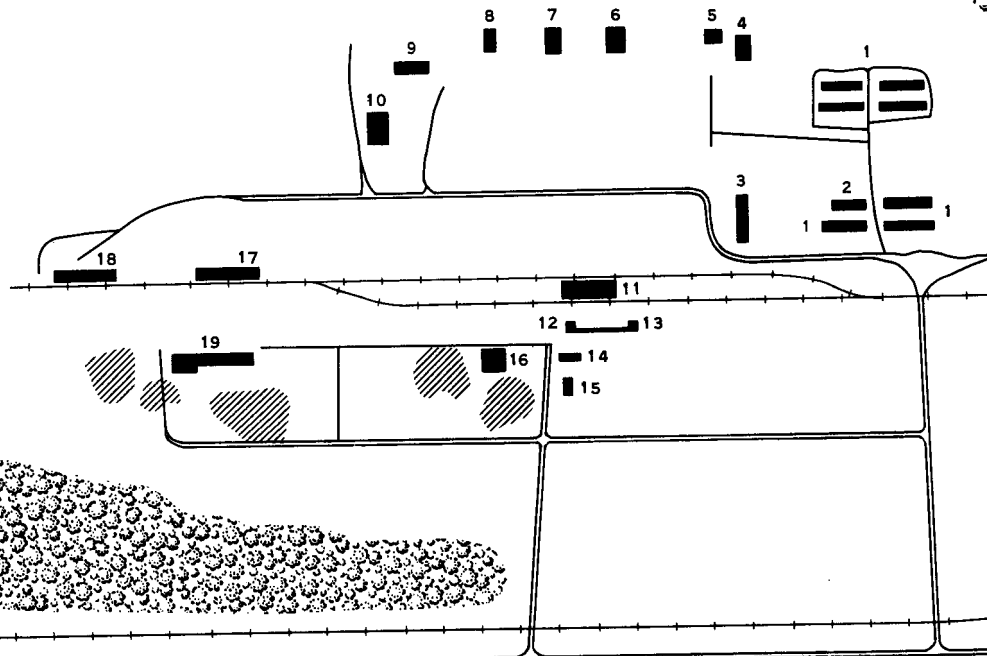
OMSK STATIC TEST FACILITY CONSTRUCTION SUPPORT AREA.
